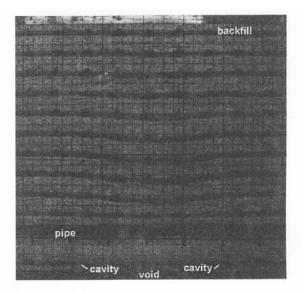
Failure pattern of longitudinal section of model 2 (flexible pipe in dense backfill)
